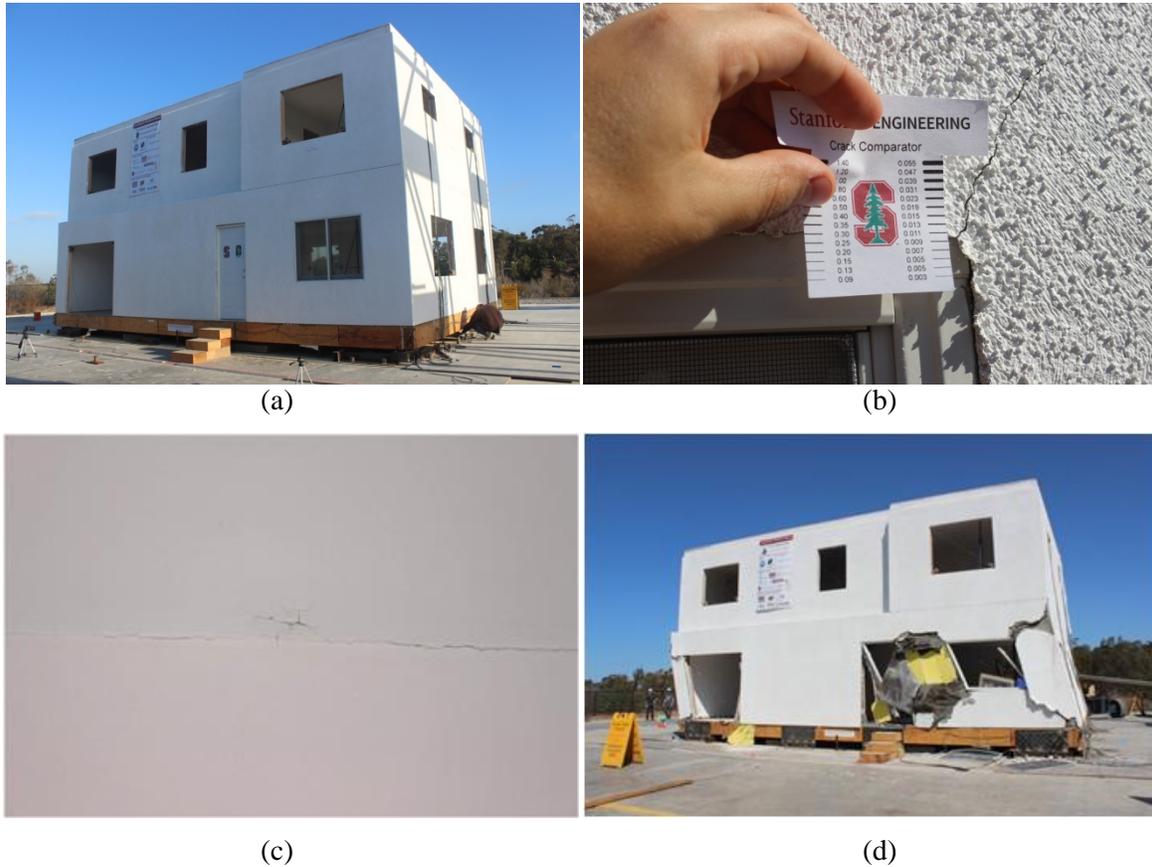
Photos of (a) house before testing; (b) minor cracking to exterior stucco and (c) cracking around a drywall fastener and panel edge following an experienced ground motion corresponding to twice the MCE level; (d) damage to the house following an experienced motion of three times the MCE level
